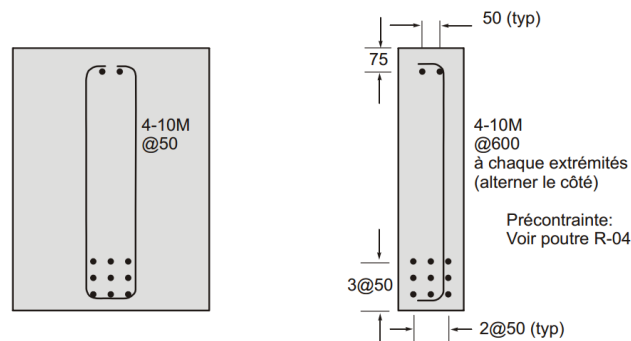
Reinforcing bars for the specimens R07 and R08
